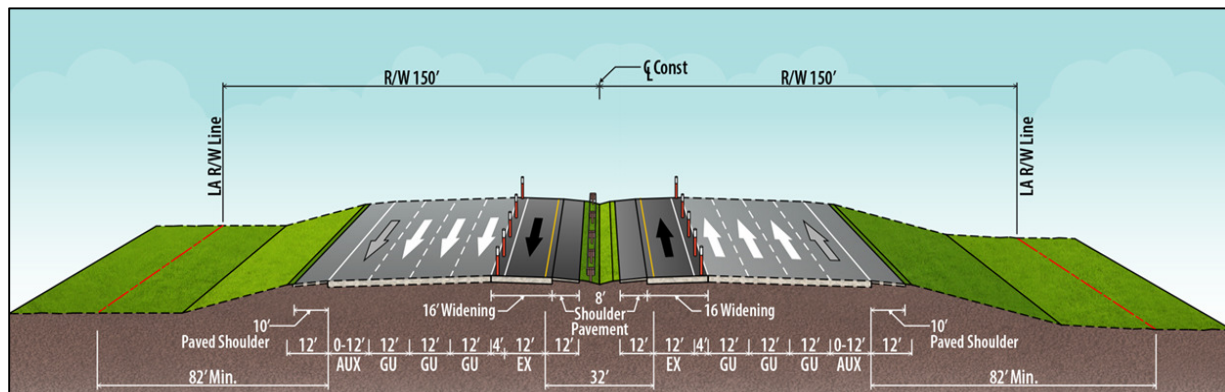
I-275 Mainline Master Plan Build Alternative Typical Section from south of Gandy Boulevard to Roosevelt Boulevard (Segment C-MP1)
